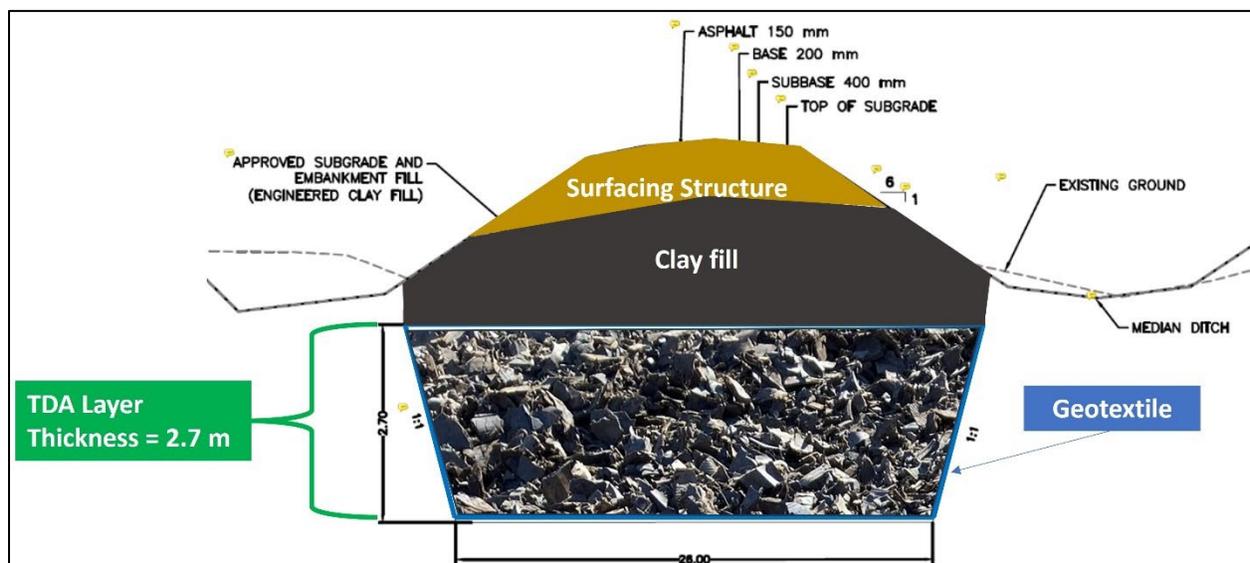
Preliminary Design Cross Section for Highway 39 Embankment and TDA Layer
